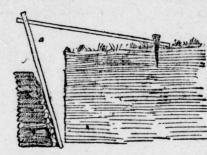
PROPERLY CONSTRUCTED WALLS. This will give a width to the wall of
